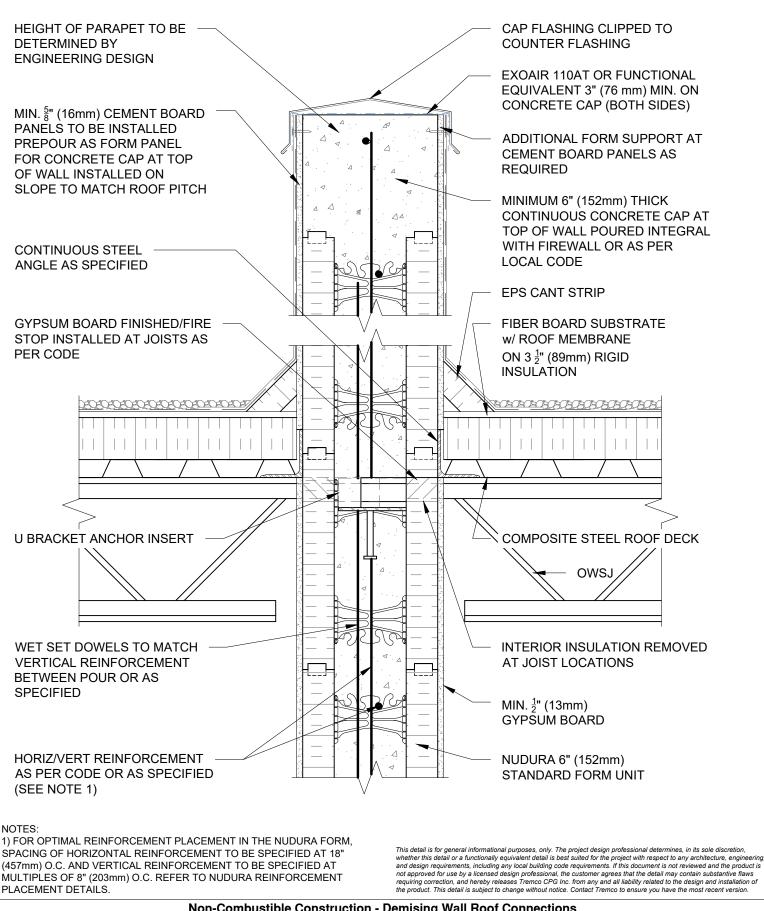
" (152mm) Form Unit, Steel Joist Roof System, Bearing Demising Wall			File Name:
